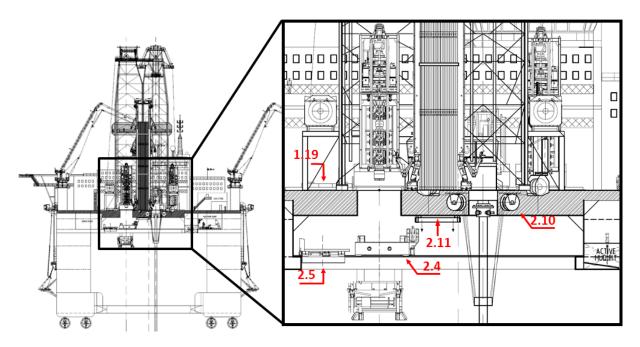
SIDE VIEW WITH A ZOOMED IN SECTION VIEW OF THE AREA AROUND THE MOON POOL.
